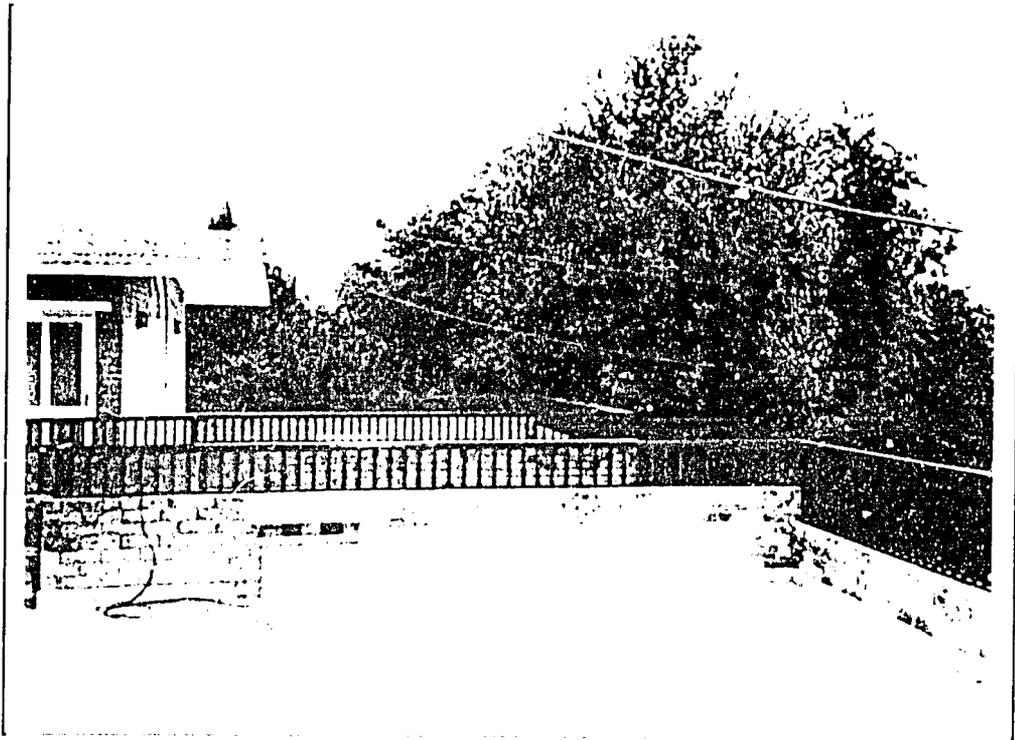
Peshawar CCSC Headquarters Building. View of Building #3 railing taken from Building #4. Cable to be installed along railing with tie-wrap.
